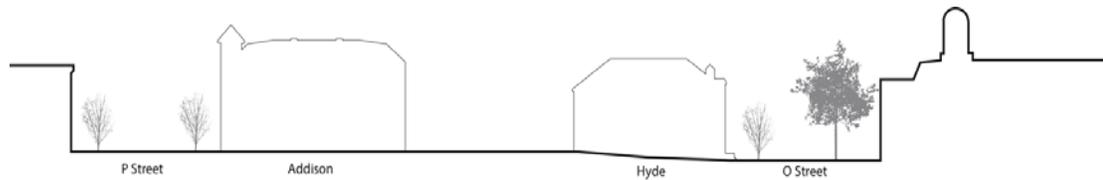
5: Section cutting through Addison and Hyde (source: author)
